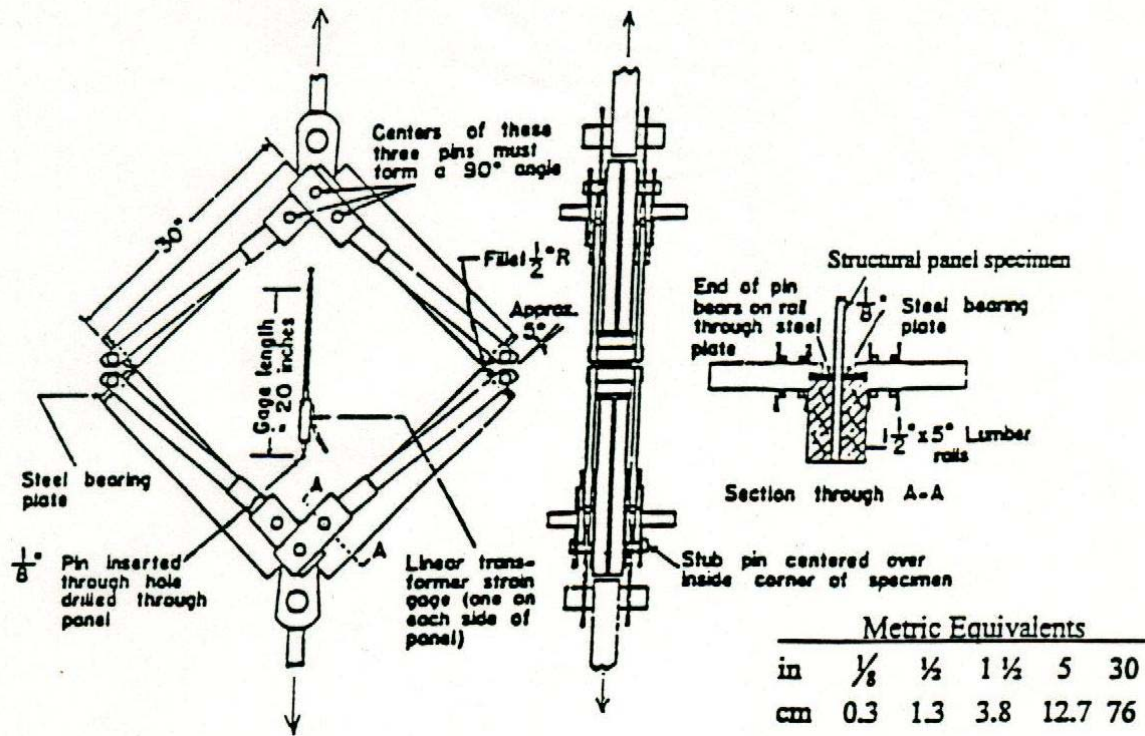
ASTM D 2719 LARGE PANEL SHEAR TEST [6]
